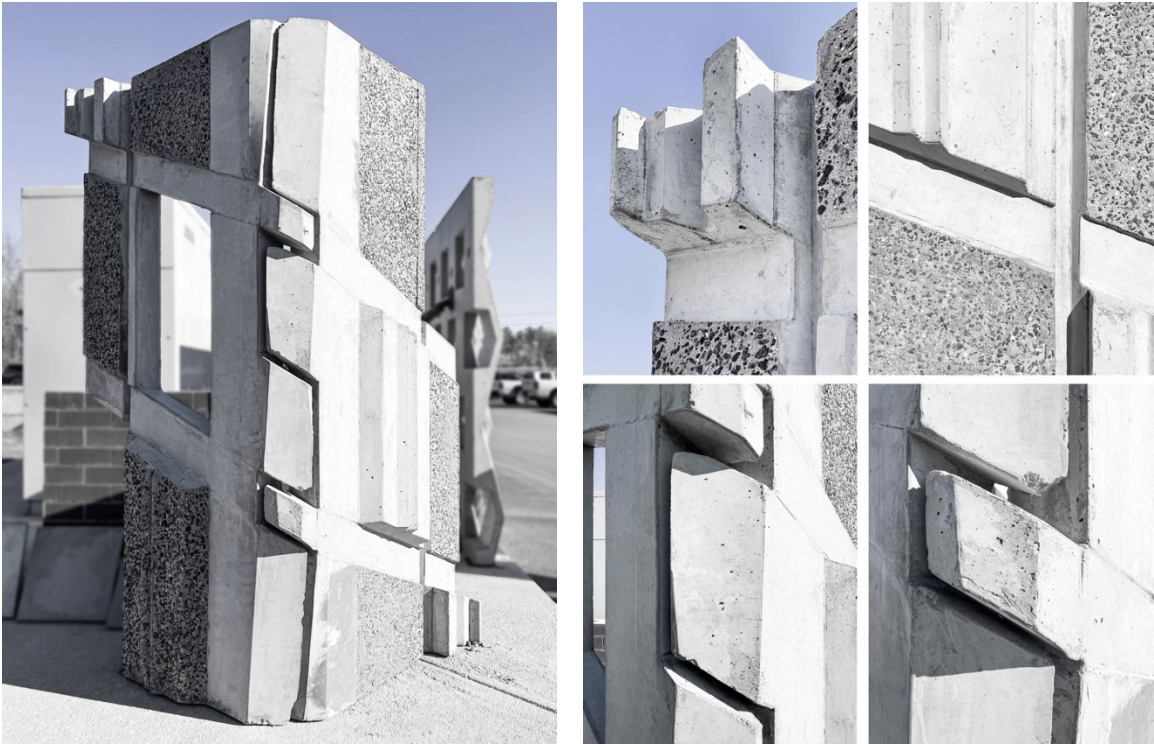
Final unique precast panels from single form at 90° corner and details of corner joint, extruded profiles, & sandblasted and revealed aggregate finishes.
